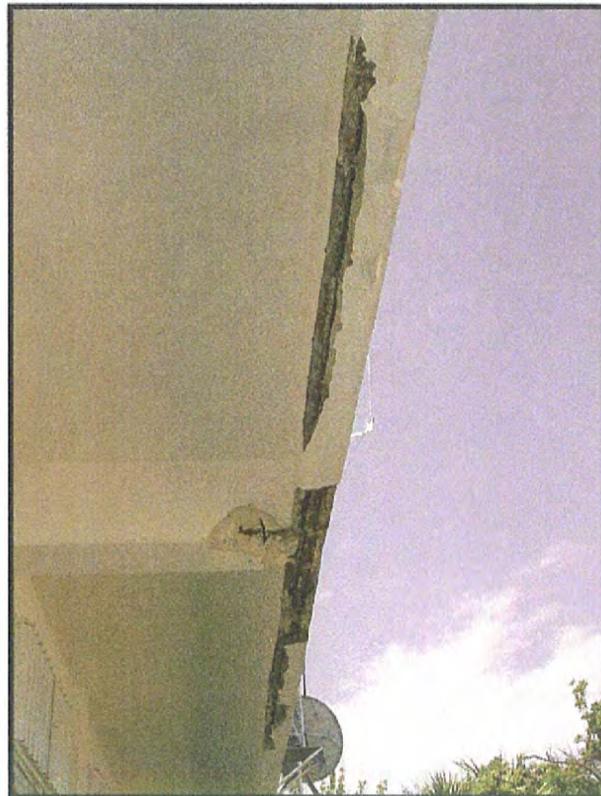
Concrete spall with exposed corroded reinforcement on bottom face of balcony edge beam along the West side of building.
